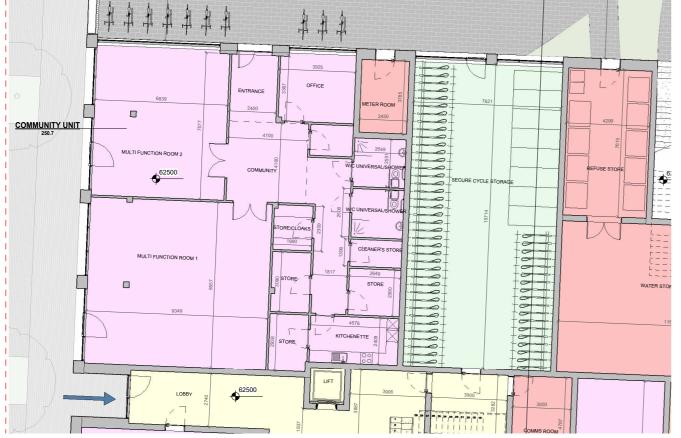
Ground Floor Plan, Site 5 illustrating the internal layout of the Community Facility
